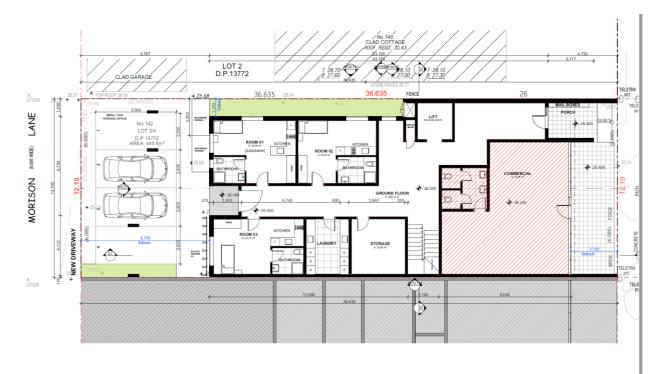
Proposed ground floor plan Source: Novo Design Architects
